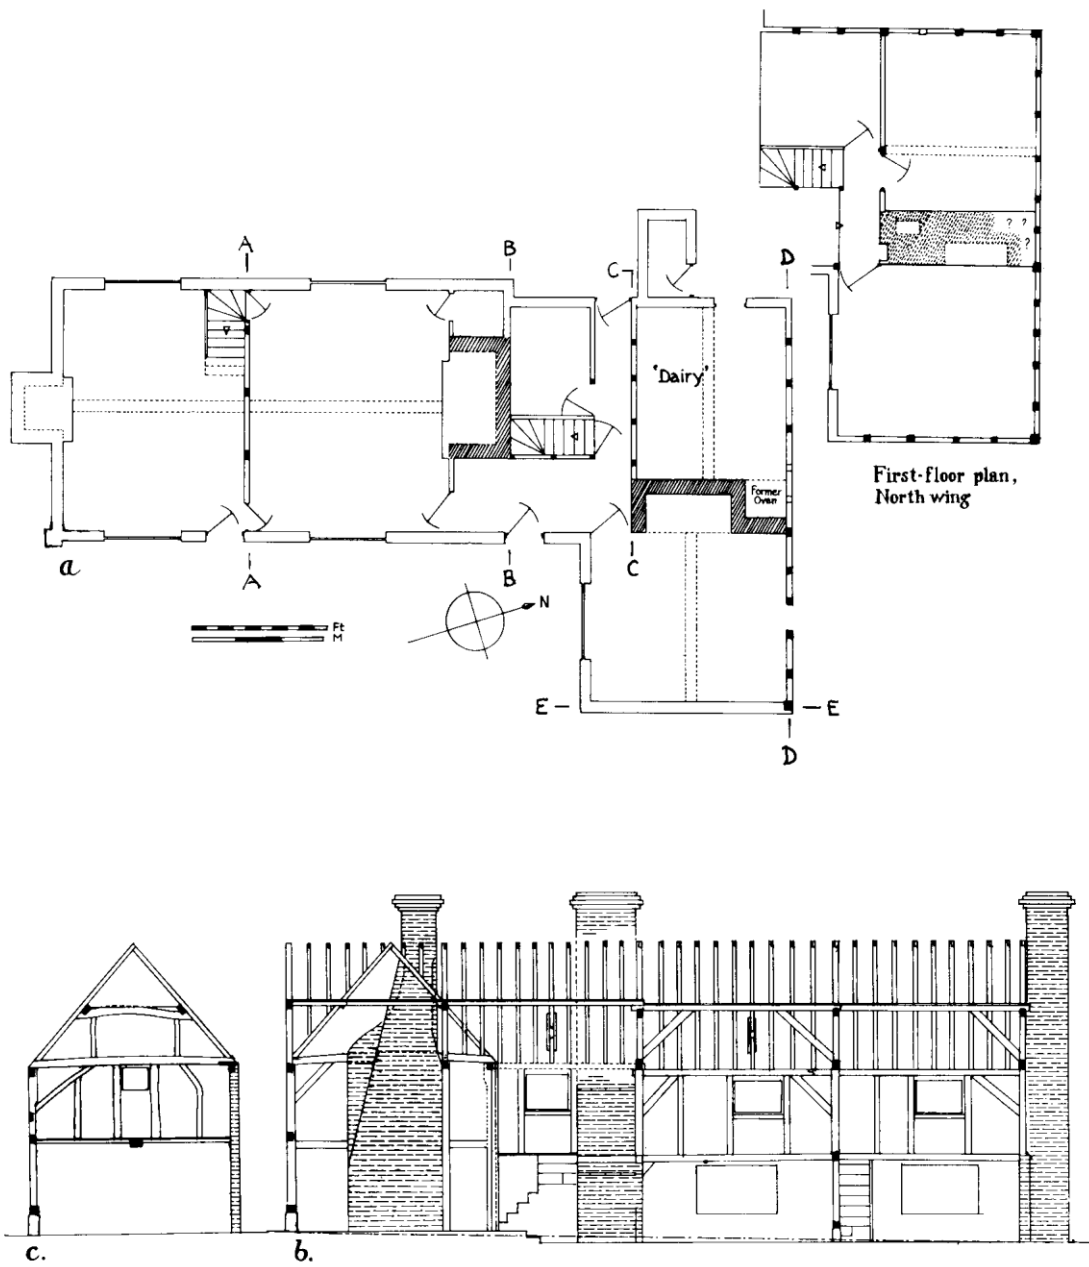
Fagnell Farm, (a) Ground-floor plan, (b) Cut-away view, looking east, (c) Section at E-E, looking east.
